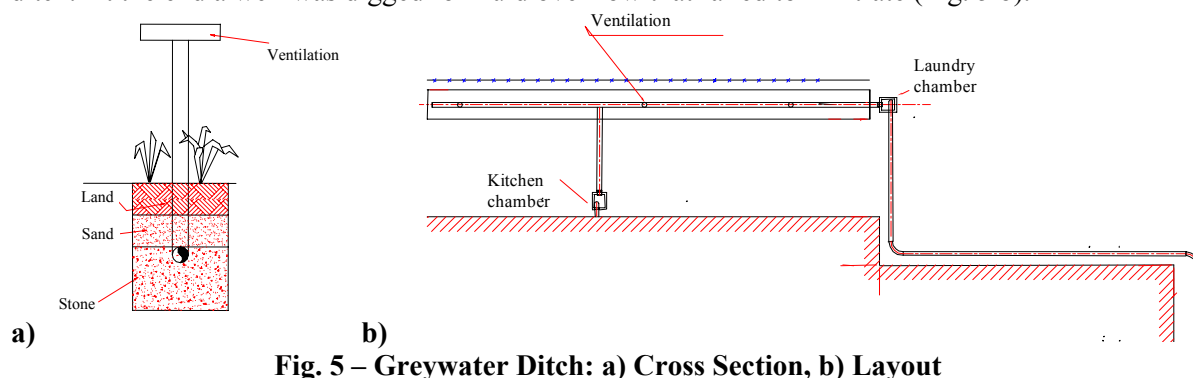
Greywater Ditch: a) Cross Section, b) Layout
